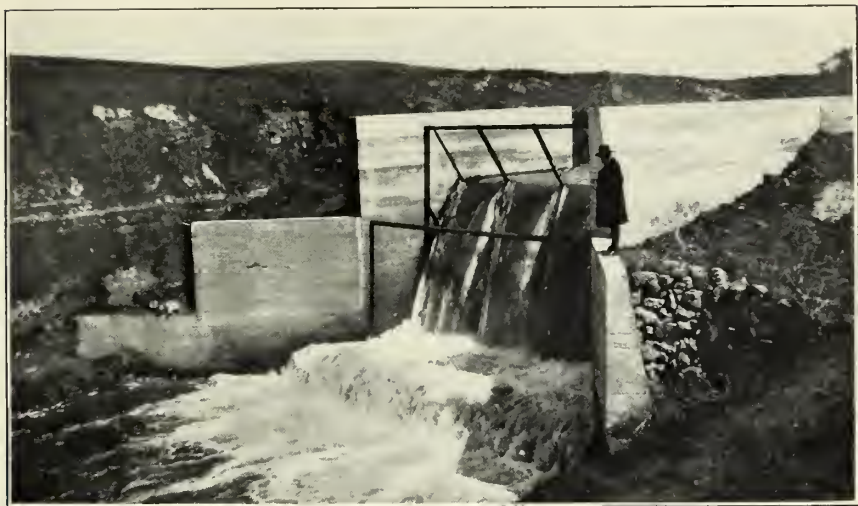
A 15-FOOT CONCRETE DROP ON MODESTO CANAL.
